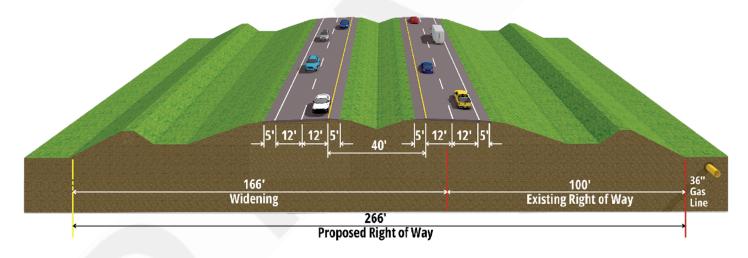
S.R. 60 PREFERRED TYPICAL SECTION 3 (BLANKET BAY SLOUGH BRIDGES)
